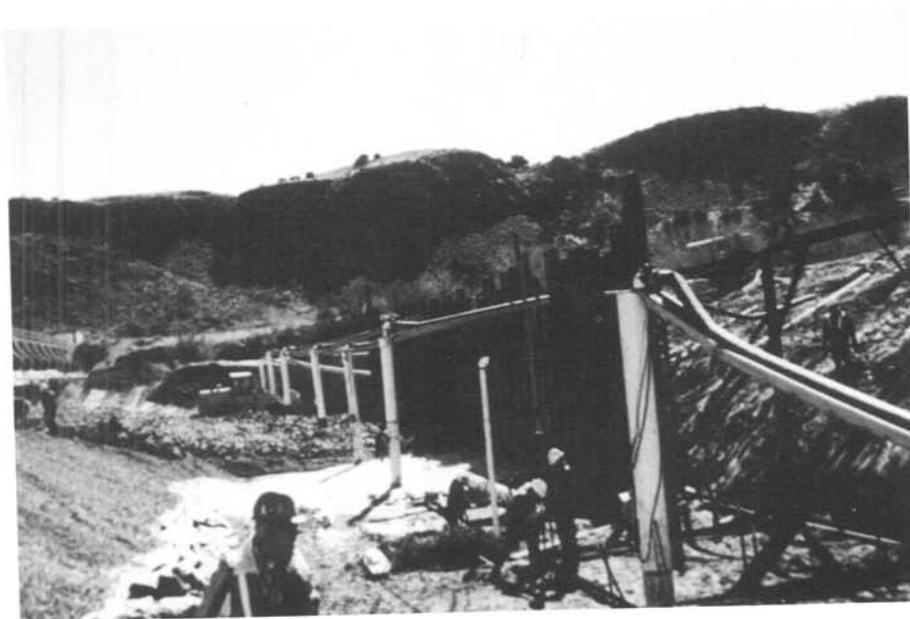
Work area showing sheet piling dewatering wells, geotextile, bedding, and riprap placement. 7/27/89
